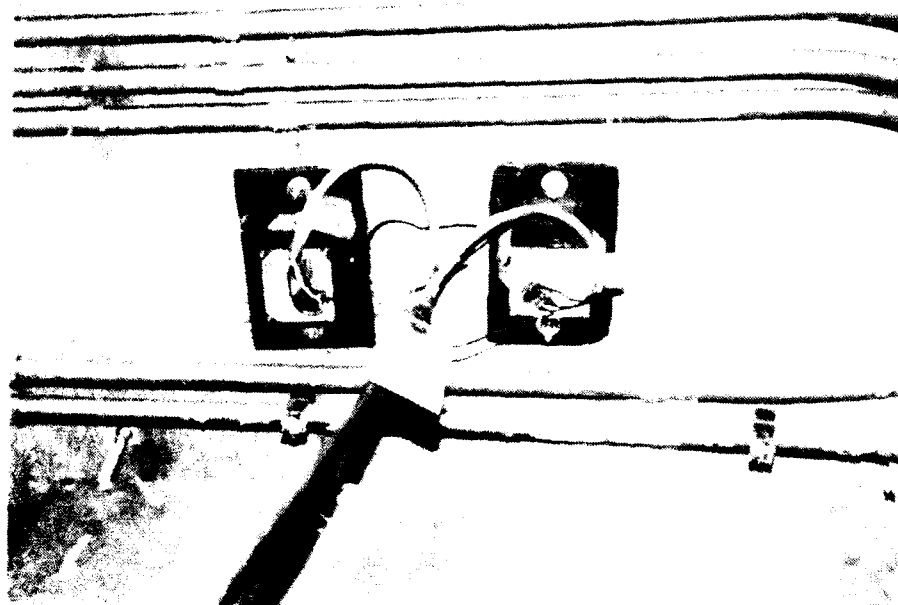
Typical accelerometer mounting on ceiling of upper floors.
